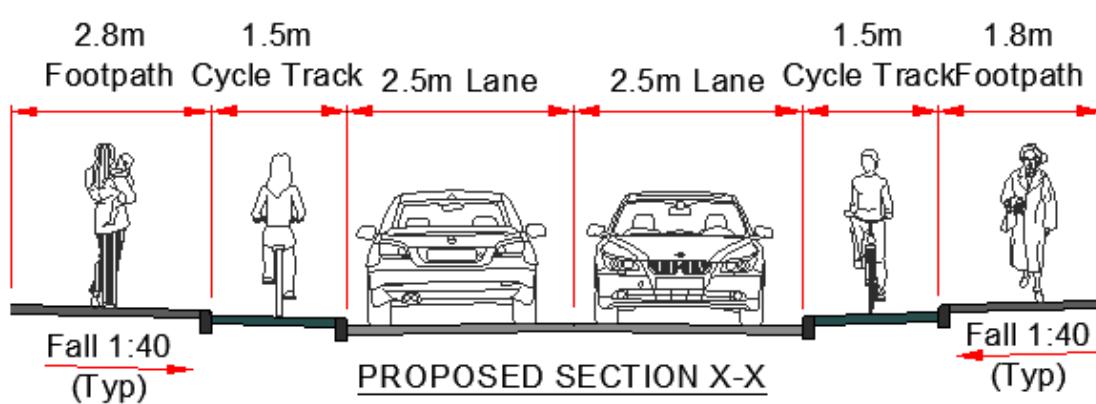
Cross Section Locations - Area 7: Ashwood to Castle Park Link
